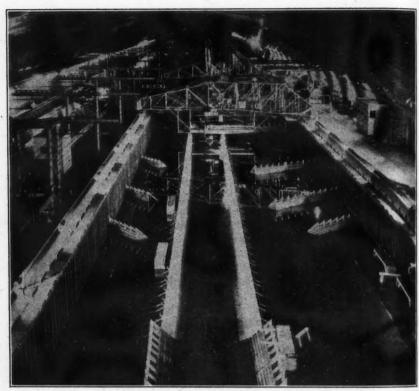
General View of Basin Building, Showing the Restricted Channel Setup in the Shallow Water Basin
